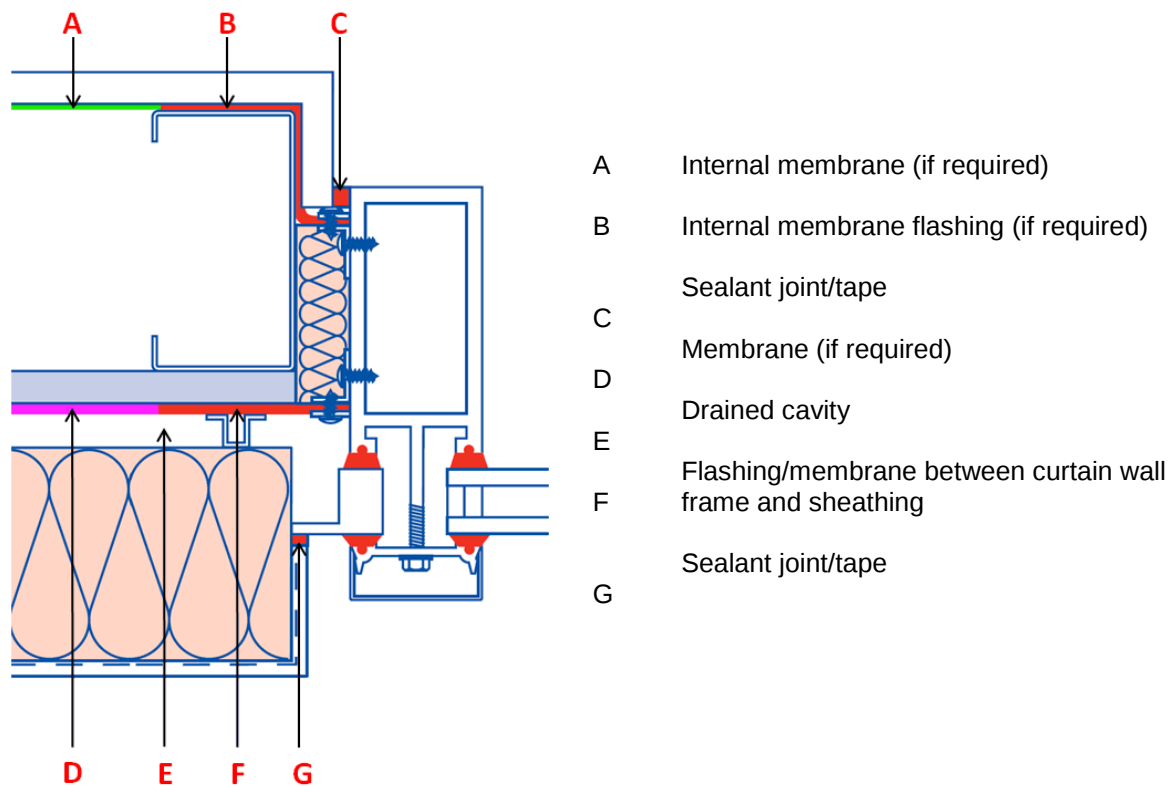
Curtain wall interface with EWIS, framed back wall (uninsulated)
